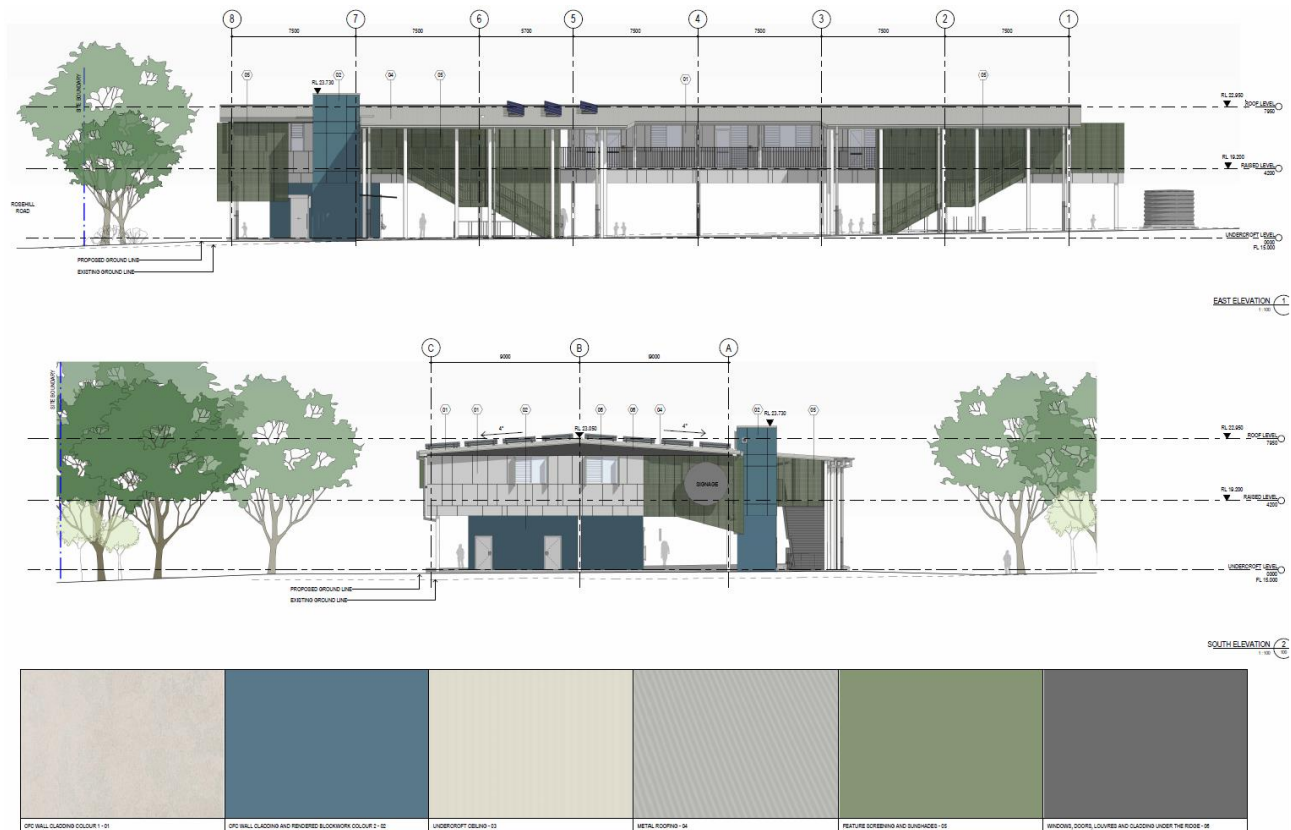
Eastern elevation (facing main playspace) and southern elevation (facing Rosehill Rd) with façade colour swatches. (Source: Pedavoli Architects)
